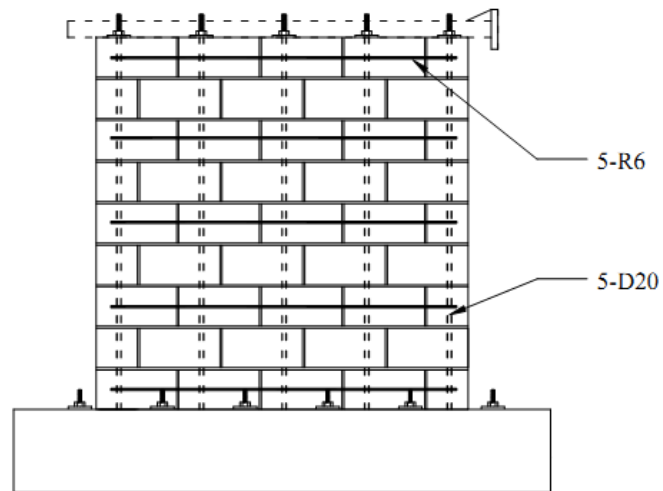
Reinforced masonry wall A1 tested by Voon (2007)
